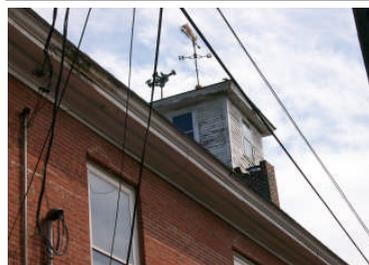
; L-13-20 'B' side Rear Siding/Window&Door Trim
